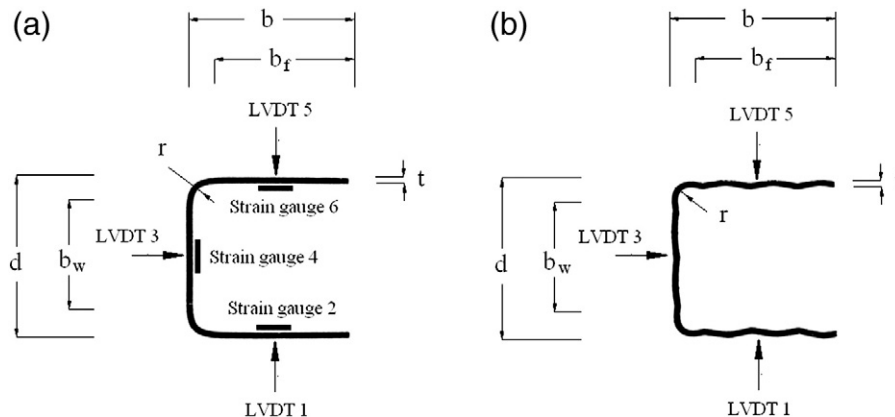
Cross sections and geometries of column specimens (a) plain section and (b) dimpled section.
